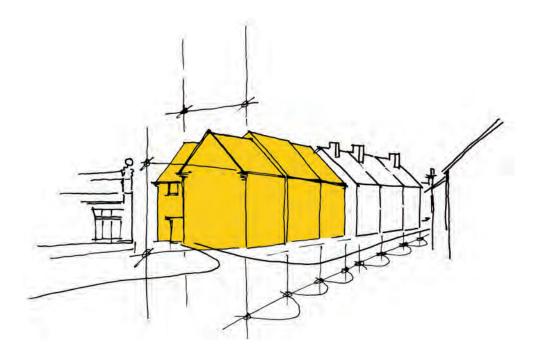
Diagram showing how new development could have picked up upon the rhythms and scale of adjacent buildings on Southampton Road with some additional development behind.
